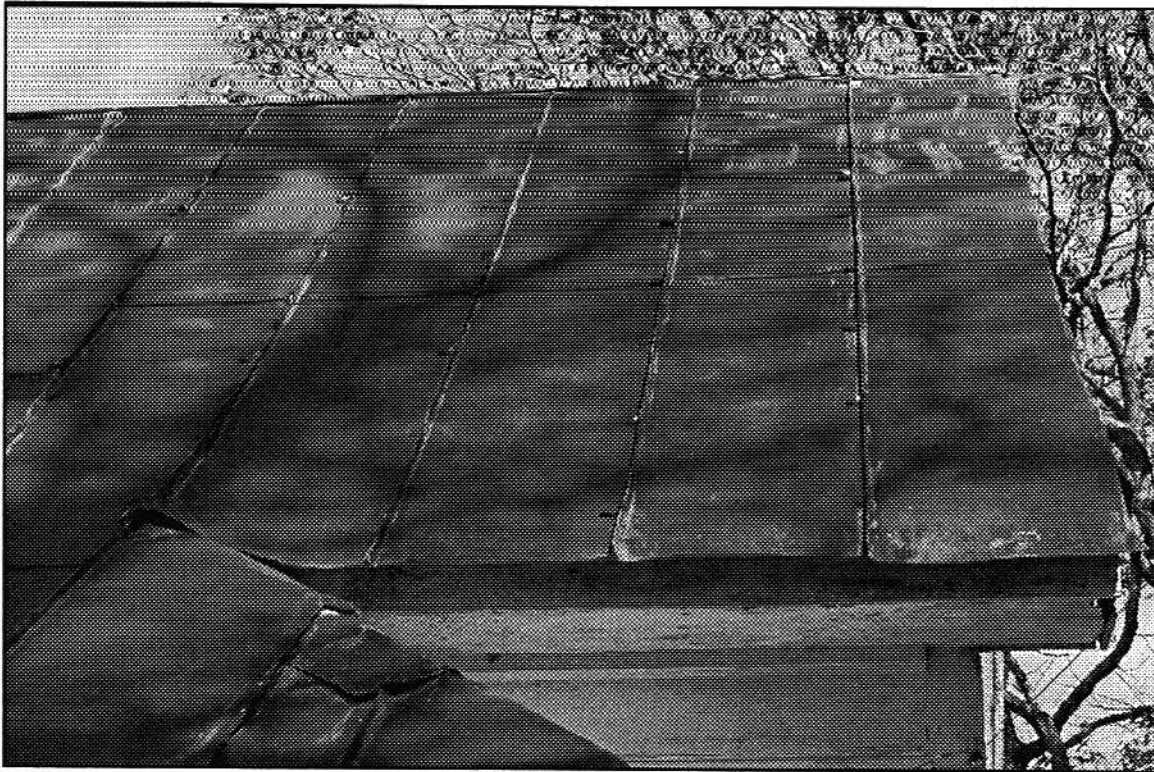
South slope at rear ell, note roof pans interlocked, not crimped and with exposed tabs.
